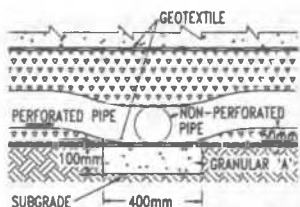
Longitudinal section through new outlet (Raymond et al., (1996).
